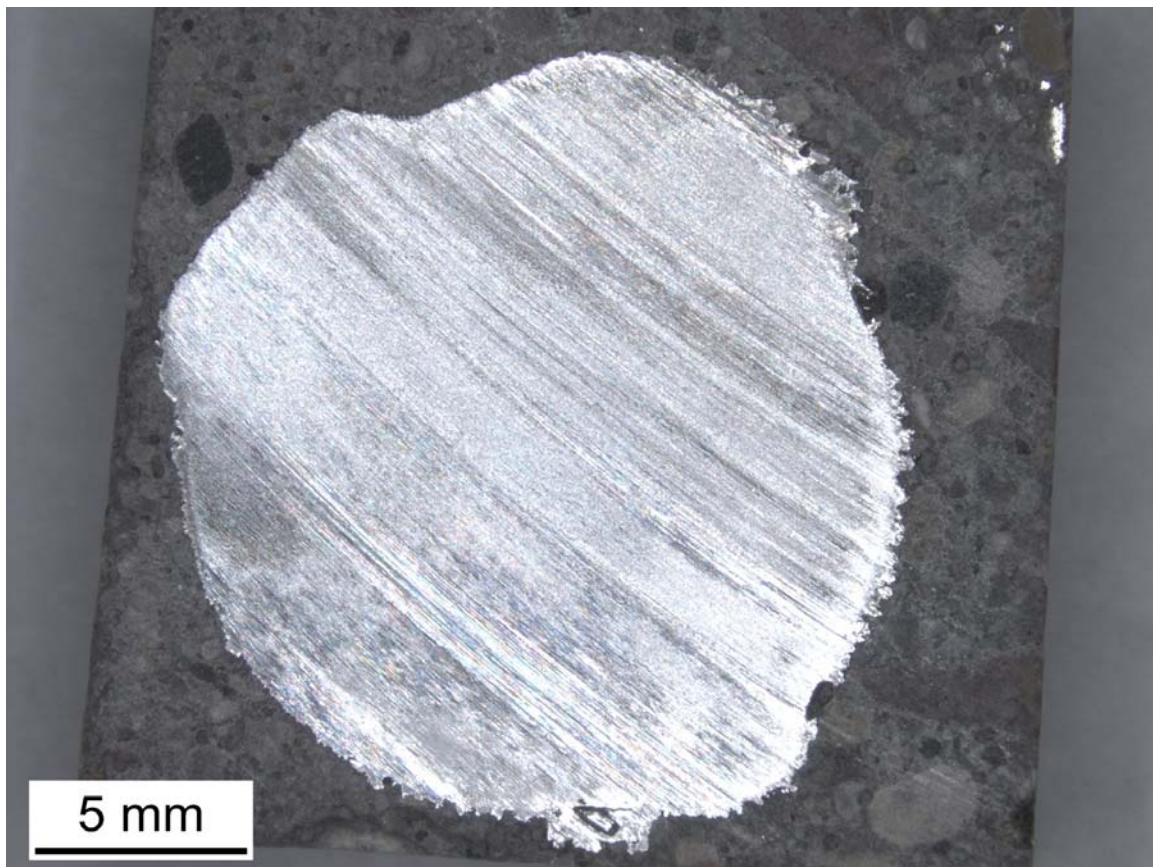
Steel bar section from core MRM 87-4 (uncracked concrete core)
